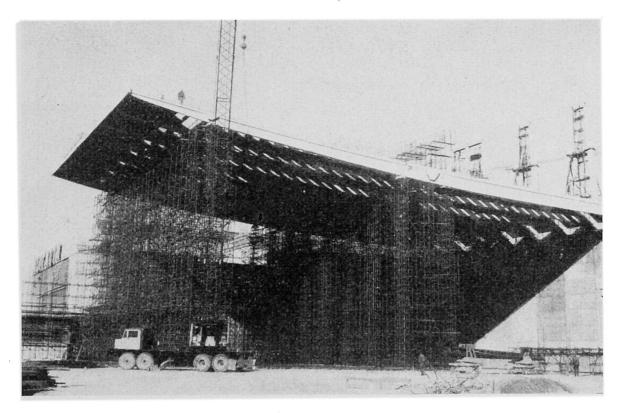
Fiumicino hangar. Assembled roof. The suspension tie-rods are still to be installed.
